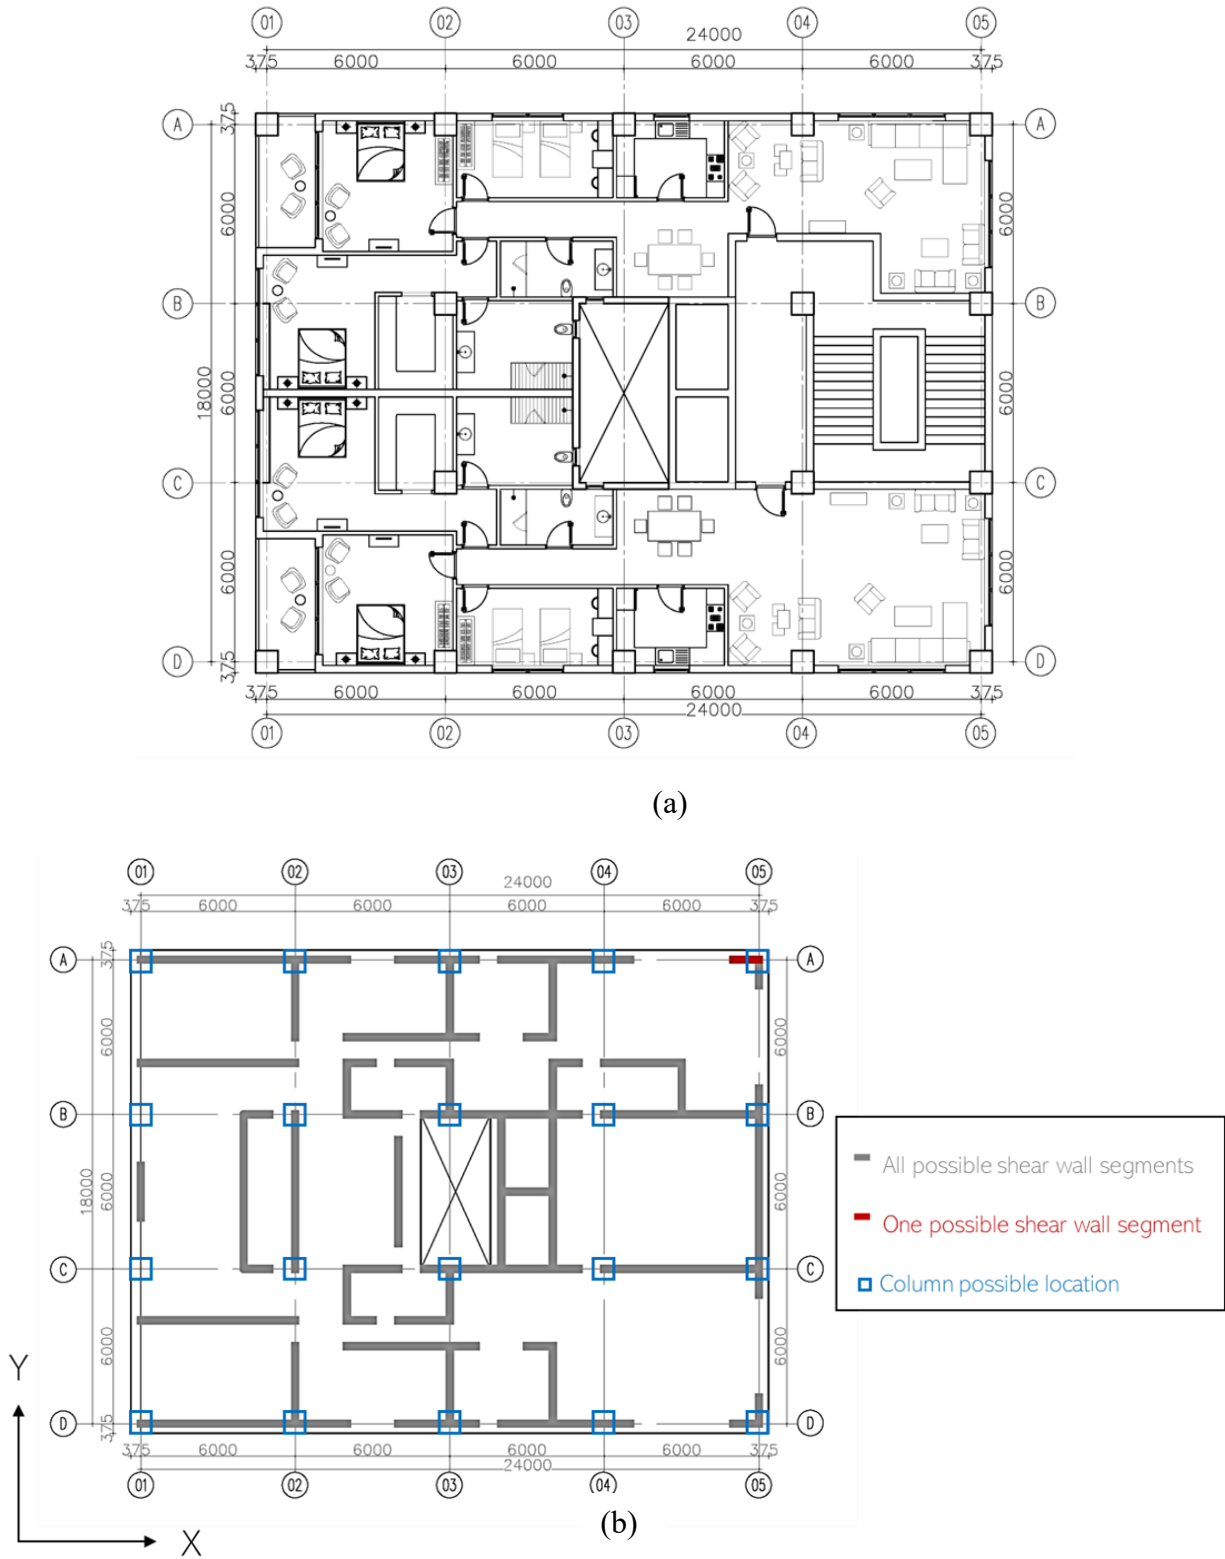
(a) Architectural plan view and (b) possible shear wall locations
